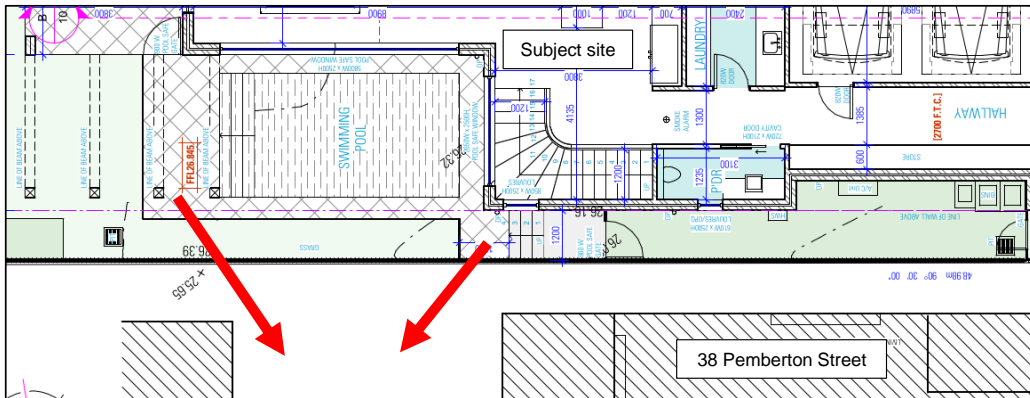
Ground Floor Plan showing areas of potential sightlines from pool area
